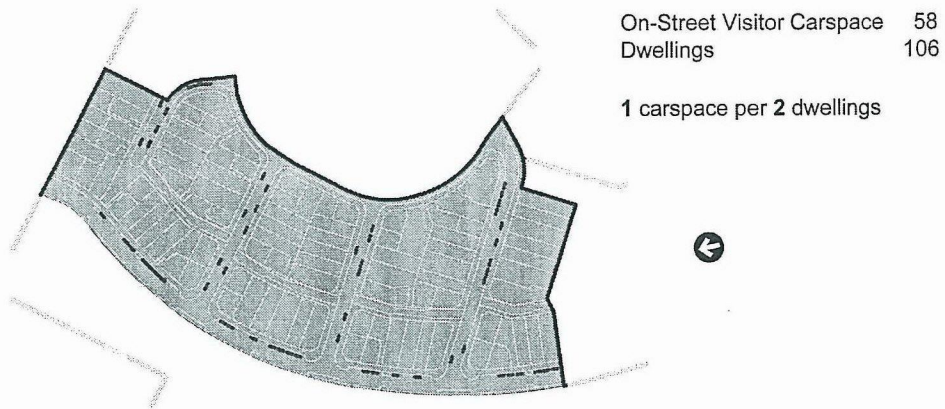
ON-STREET CAR PARKING SPACES (STAGE 2)
